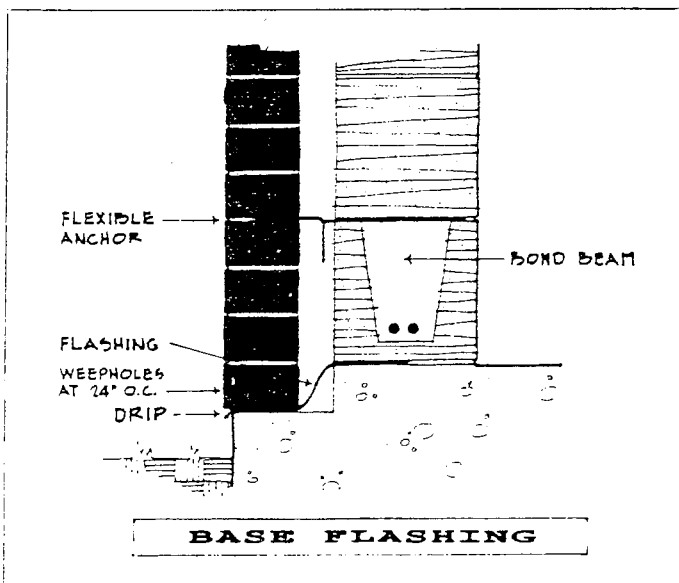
Installing flashing at the base of the wall provides one last route to drain water to the outside. Project the exterior brick slightly over the edge of the foundation to create a shadow that hides the exposed flashing and any differences in tolerances.
